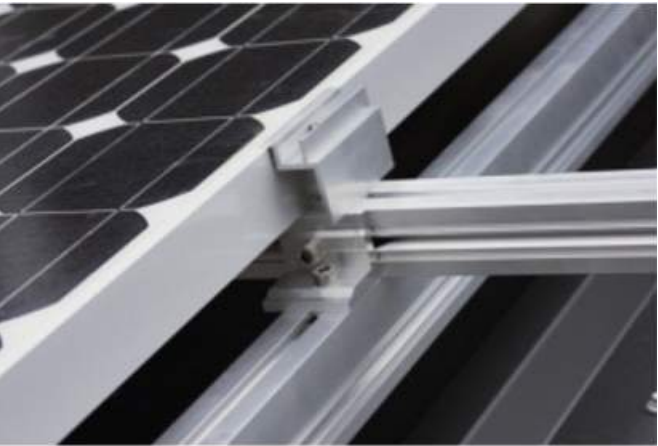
PV panels mounted with clamps on a rail system (Zonnepanelen-Voordelig, 2020)
